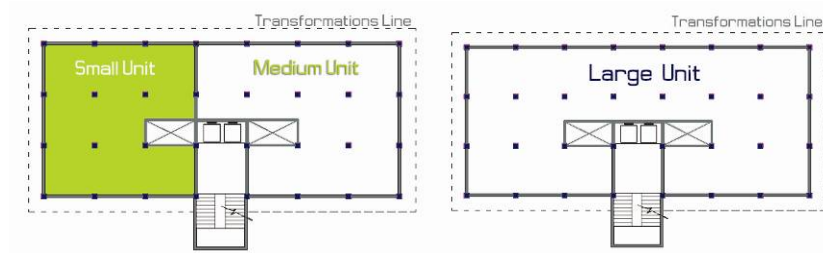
The Skeleton plan of project House-ID; illustrating the 3 Units types in the residential building – Source: Researchers
